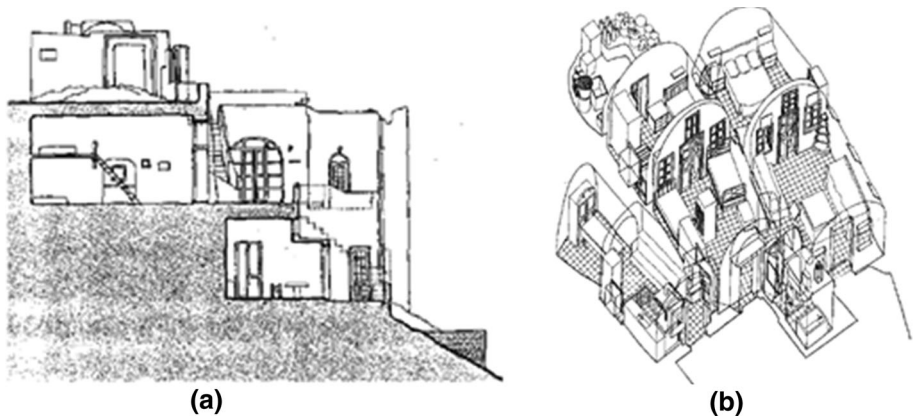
a Cross section of stepwise excavated dwellings; b typical interior of excavated houses. From Stasinopoulos (2002)
